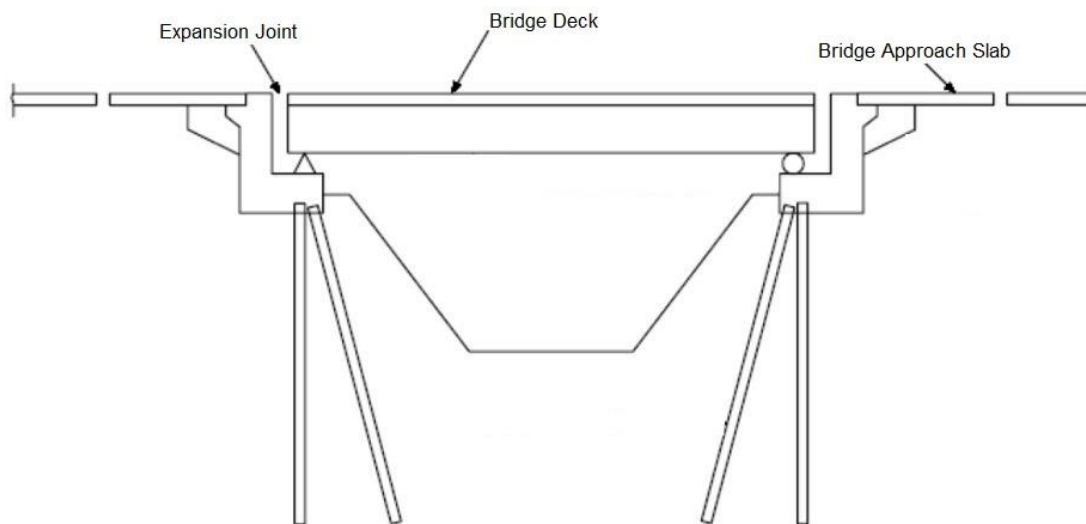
Schematic view of bridge approach slab (Paraschos et al. 2016)
